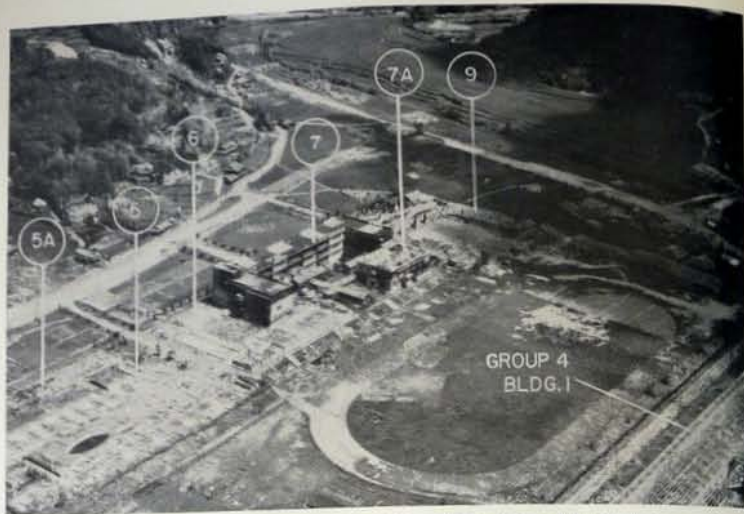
5,900 feet from GZ. Group 1, aerial view of Nagasaki Boys' Normal School, looking northeast.
